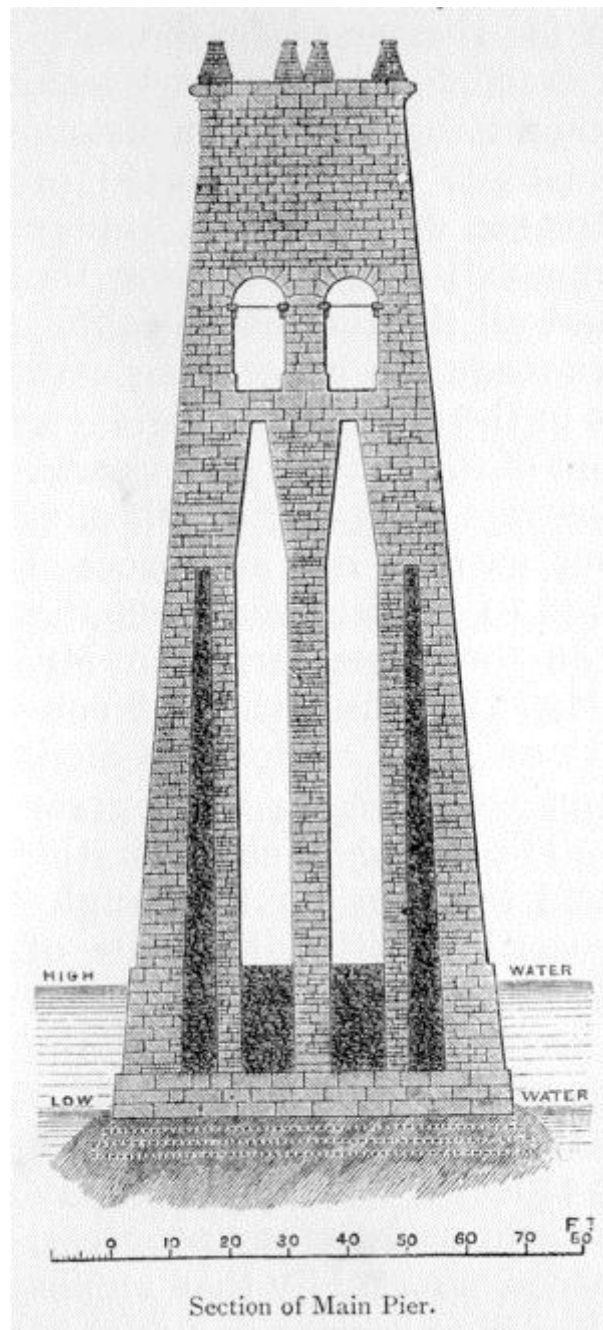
Section of one of the two main piers of the Menai Suspension Bridge (Smiles 270).
